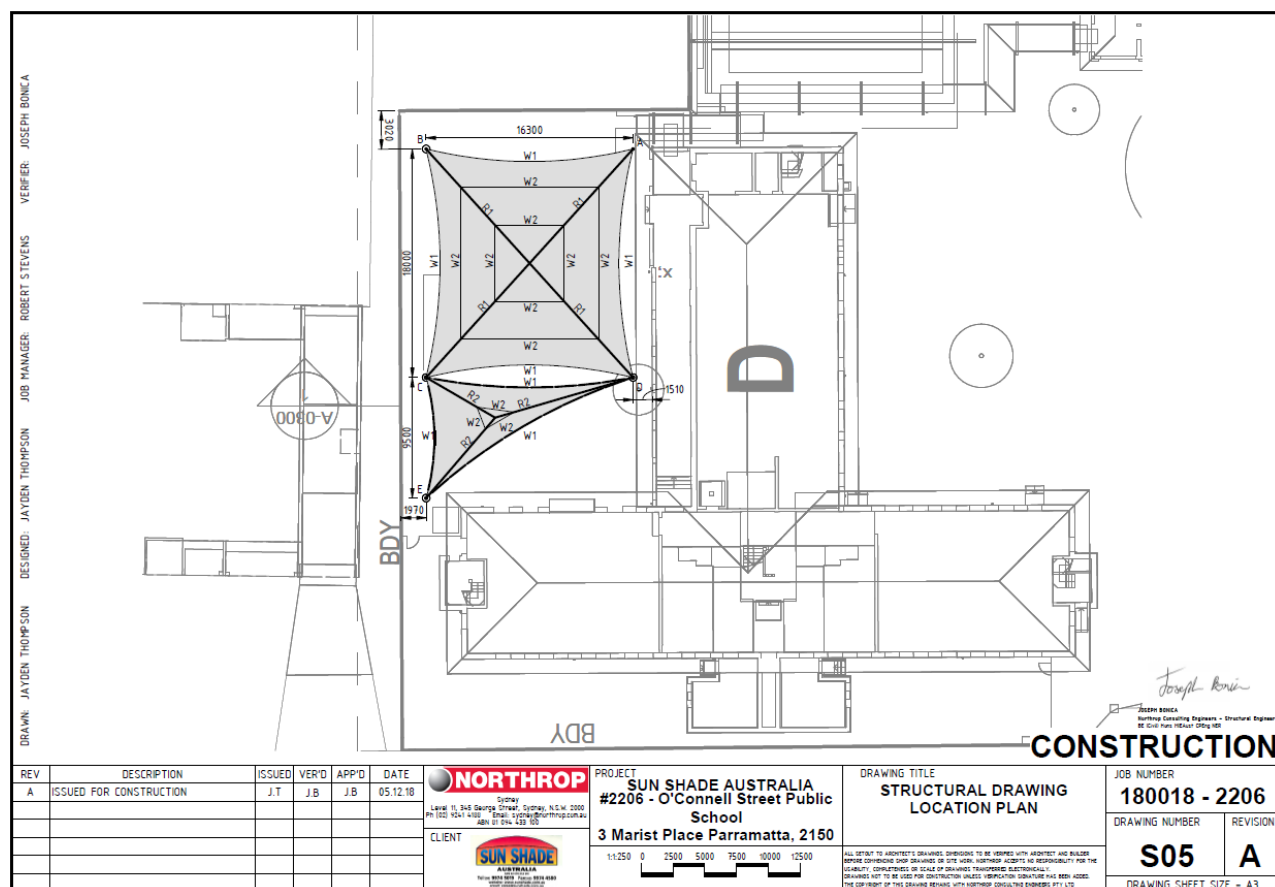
Extract of Structural Shading Drawing Depicting the Proposed Development
